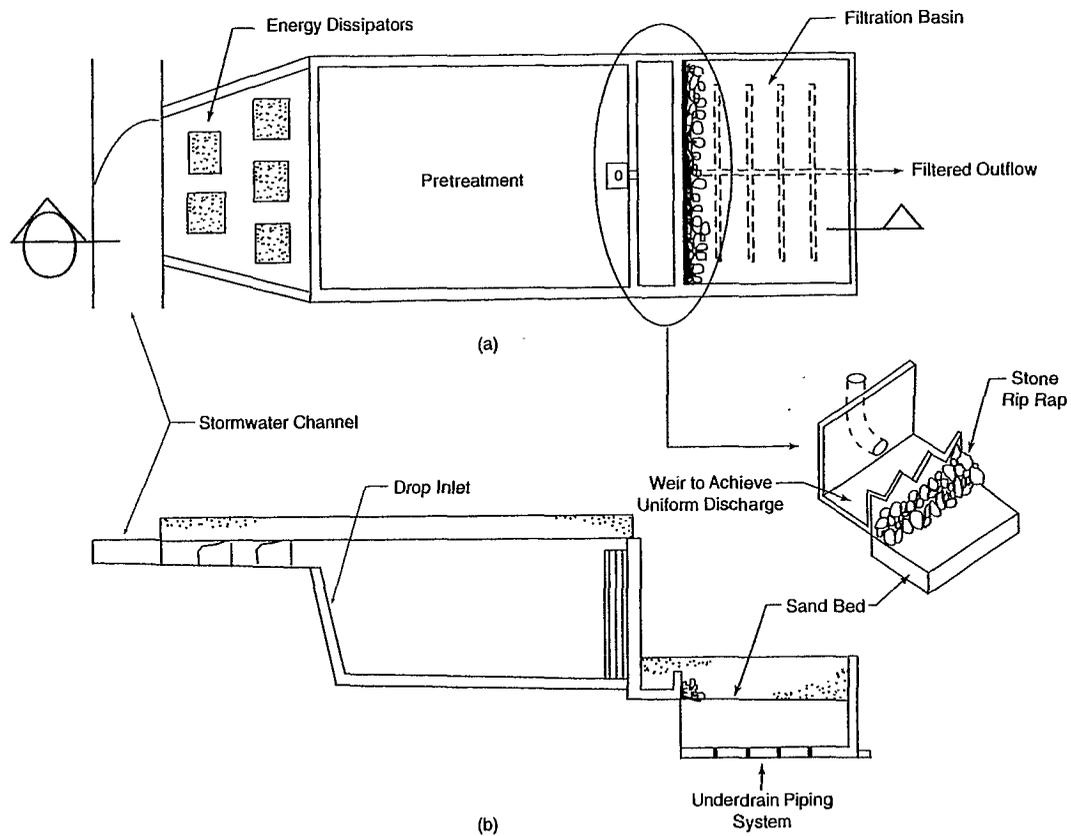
Sand filter with a presettlement basin: (a) plan view and (b) elevation.
